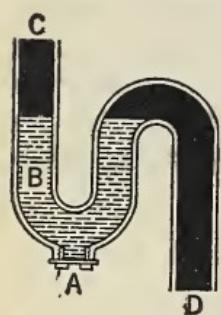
S-trap. A, removable cap to make it possible to clean the trap; B, water standing in trap seals it against returning odors; C, sink attachment; D, waste-pipe attachment
